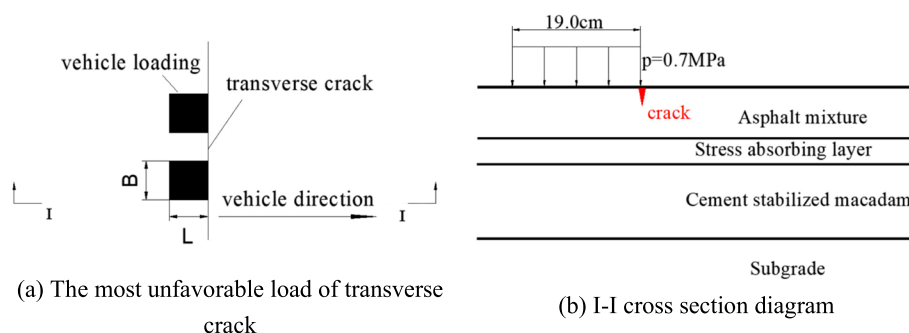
Diagram of cracks. a The most unfavorable load of transverse crack. b I-I cross section diagram
